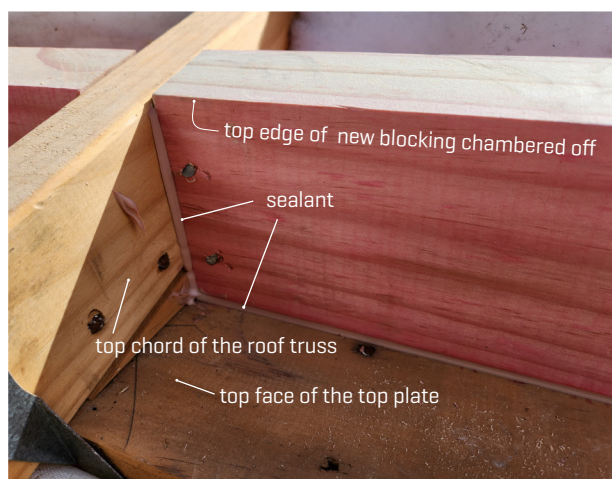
Continuous solid blocking and sealant was installed at the top plate/roof junction to improve airtightness.
